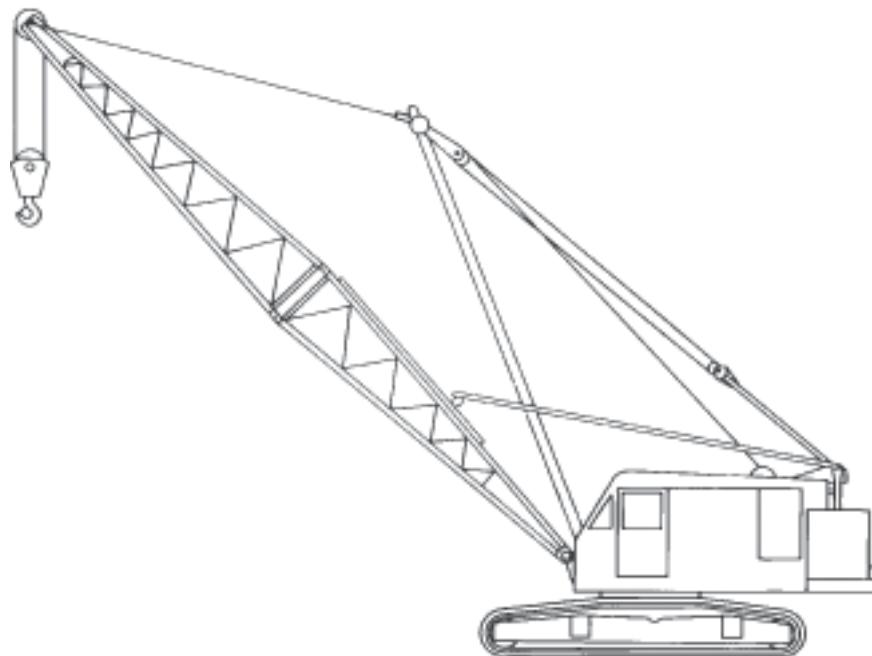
Crawler-mounted lattice boom with slewing upper structure
